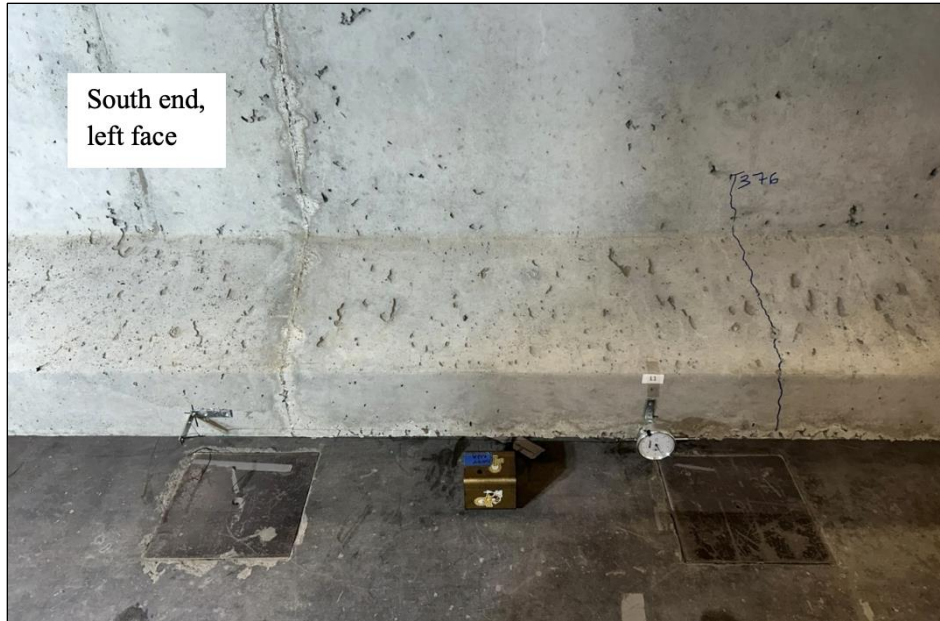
Photo. Test 3.2.S (repair 3.2RBF) flexural cracks toward the midspan, on nonrepaired, original girder face at 376 kip (left face of girder pictured).
